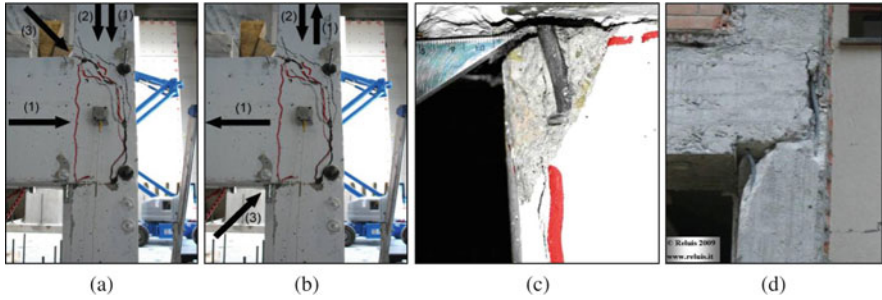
(a–c): Damage of the beam-column joint of Column C1 at the 1st storey: (a) forces under positive loading; (b) forces under negative loading; (c) concrete spalling and rebar buckling; (d) Pettino (Aq), damage of a beam-column joint in the Aquila 2009 earthquake
